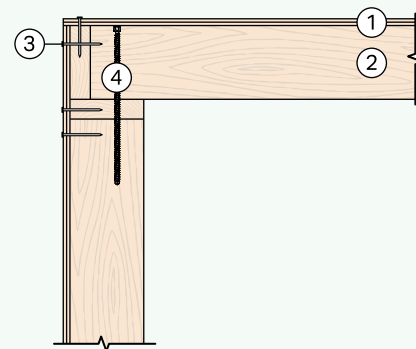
shows nailing to transfer the plywood/OSB load into the floor laminations, and screws to transfer load from the floor NLT to the NLT laminations in the wall below. Nailing between the rim board and the wall sheathing would then transfer load from the wall rim board to the wall sheathing. Figure 4.21 shows a similar load path using a rim board; if the strength of the nails between the laminations is being accounted for, either additional connection directly between the floor diaphragm and the NLT wall laminations is required, or additional nailing as needed to transfer the loads is required.
